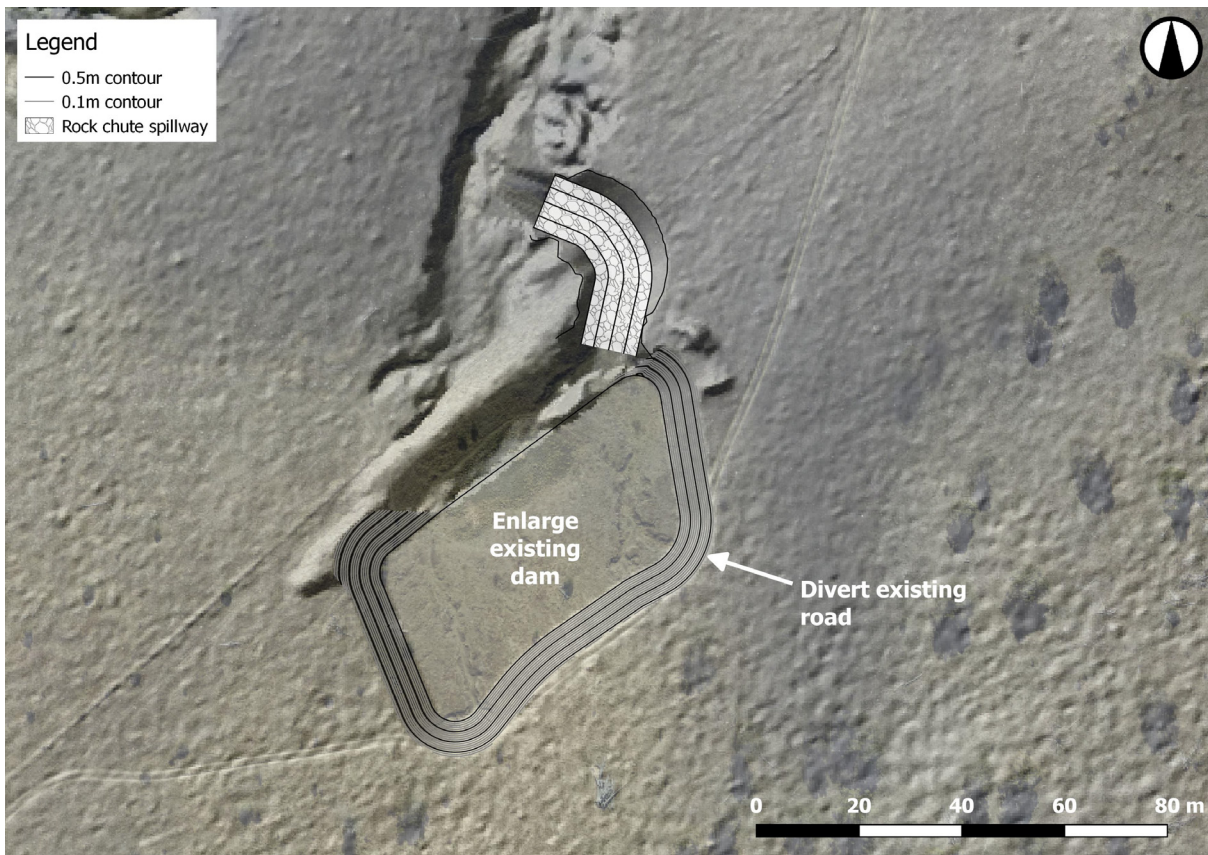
Overview of proposed farm dam excavation and rock chute spillway works
